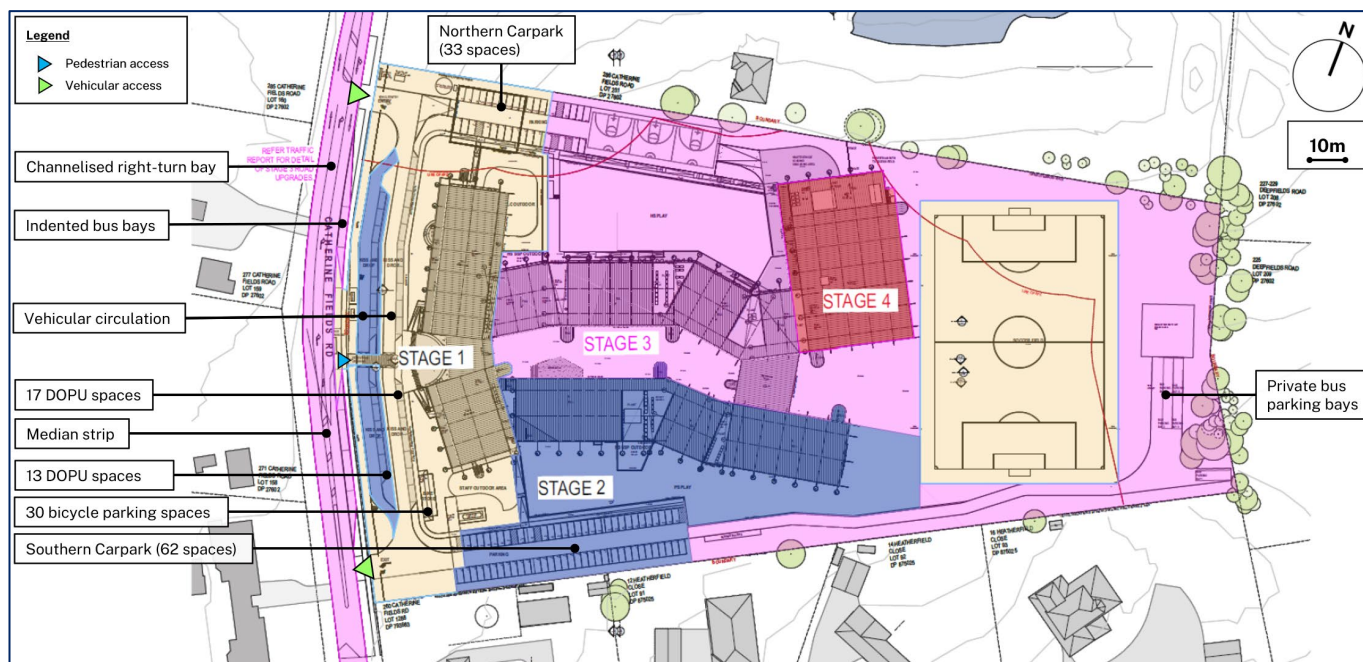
| Proposed on-site and off-site transportation infrastructure at final development stage (Source: Applicant's ARTS, 2025)
